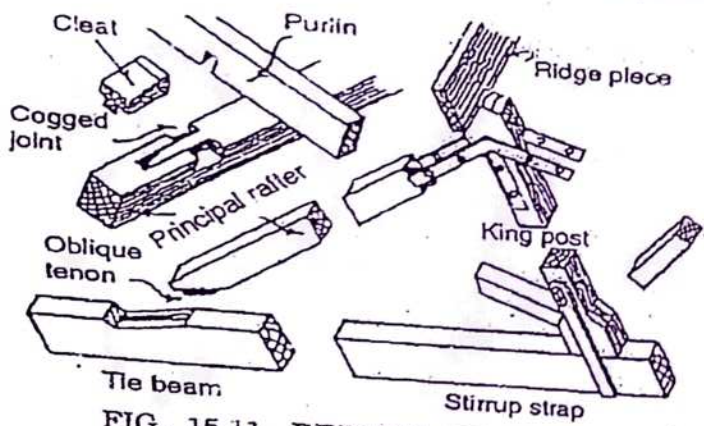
DETAILS OF JOINTS IN KING-POST TRUSS.
